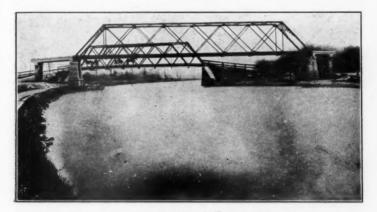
Section of canal showing enlargement of prism and new standard bridge as compared with old Eric Canal bridge.
